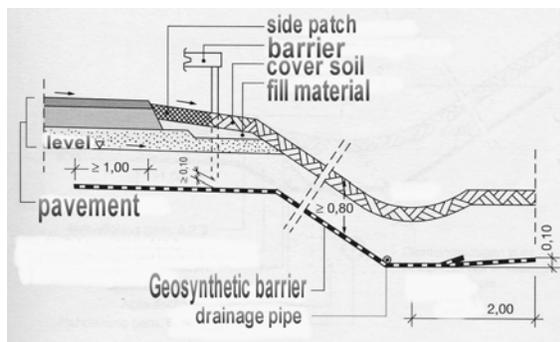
Basic drawing for a road cross-section zone III "drainage over the slope"
